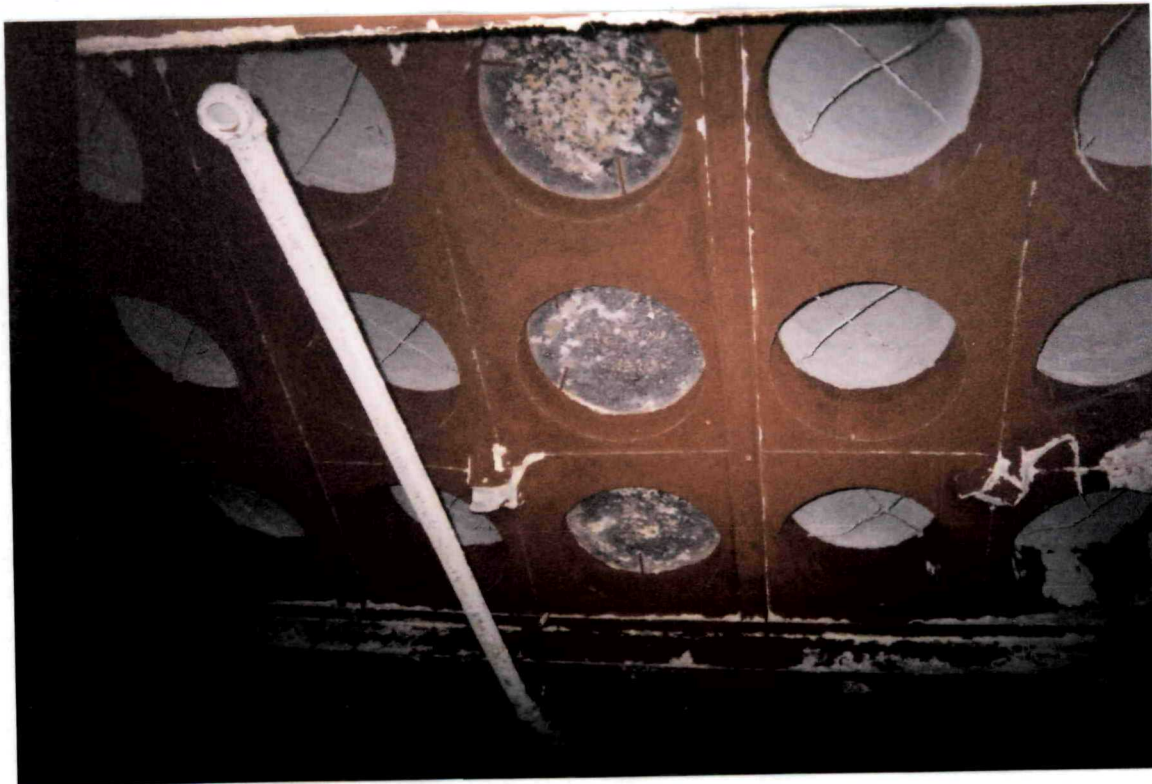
; Facility: ASARCO East Helena Smelter; Subject: Inside Baghouse Cellar;
